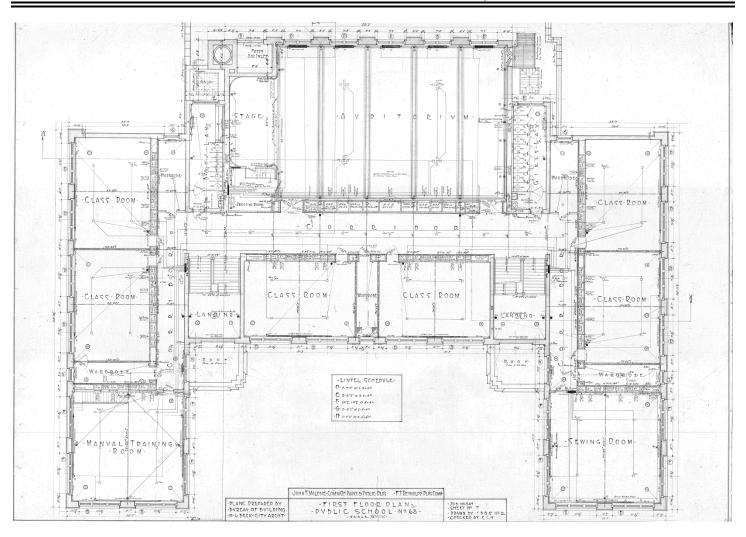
First Floor Plan, School No. 63, Howard L. Beck, Architect, 1917
